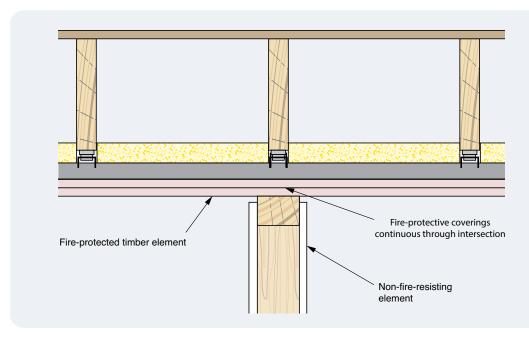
Junction of non-fire-resistant wall and fire-protected timber floor.
